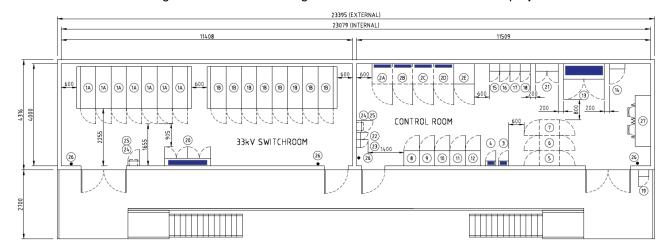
Typical combined Switchgear and Control Room Building, with 2 sets of 33kV switchgear
